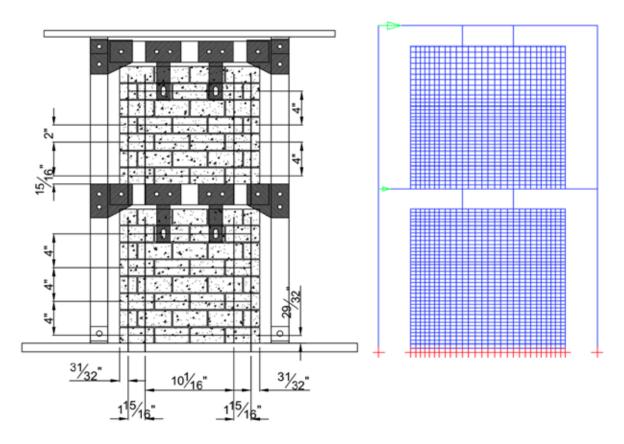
Reduced scale model of a type I hybrid masonry wall: Geometry (left) and finite element discretization (right)
